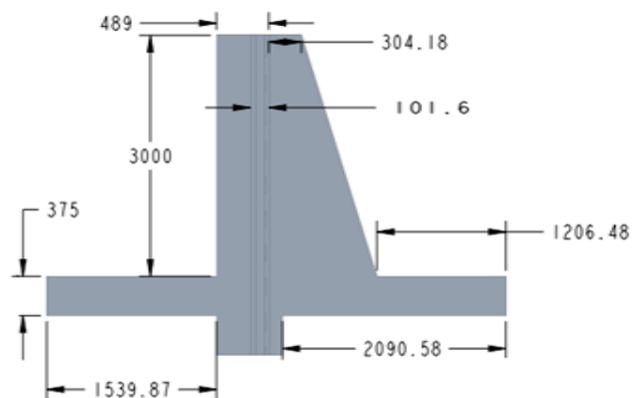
Model of Normal Retaining wall with Dimensions in mm
